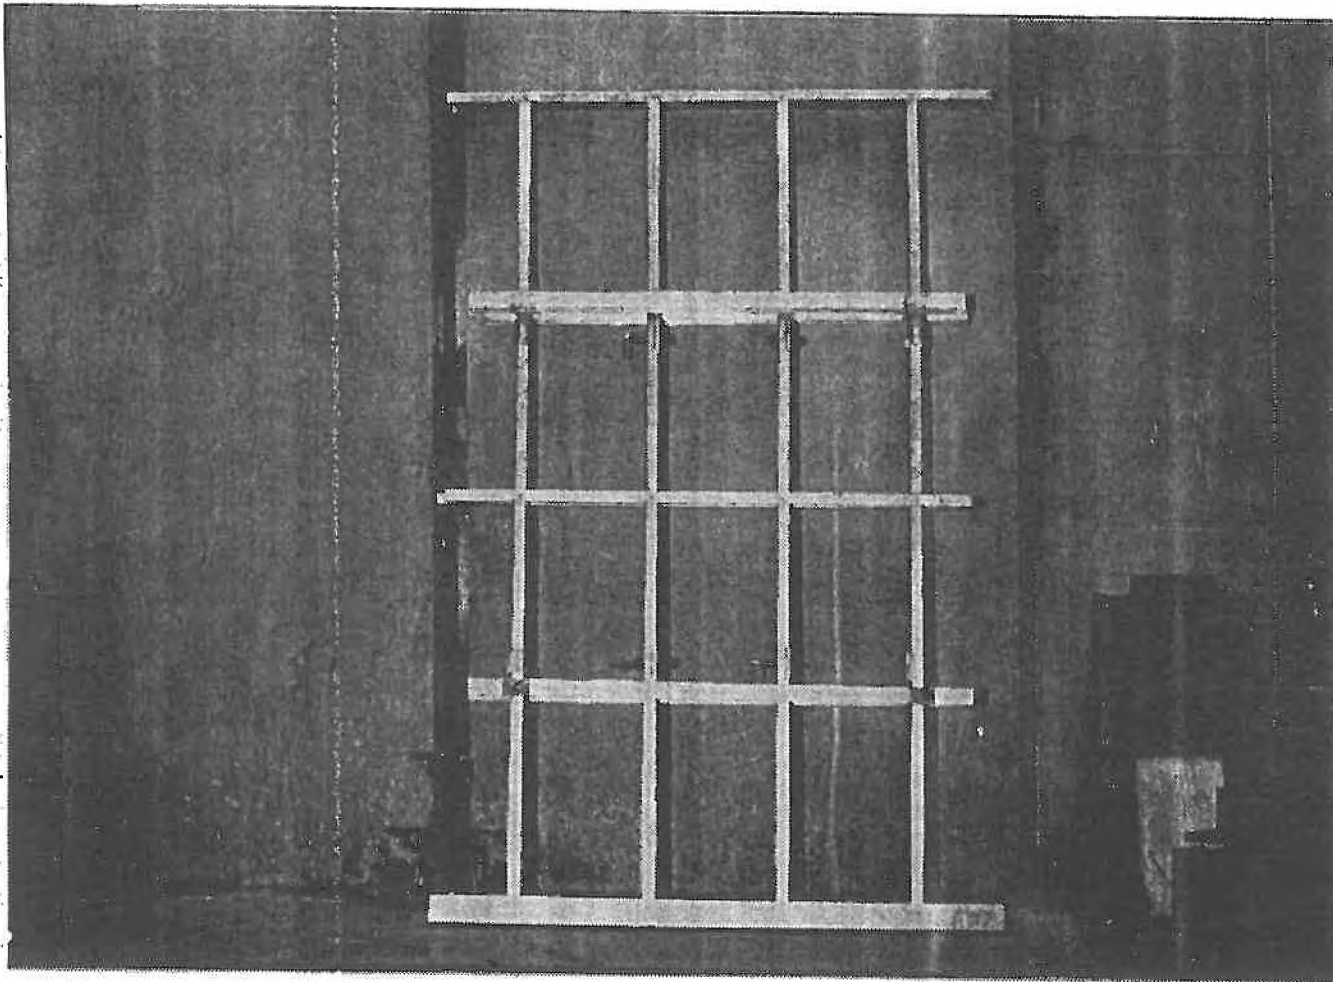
Photograph of a 4 Stud Wall Specimen Showing Additional Lines of Bracing for Exterior Studs
